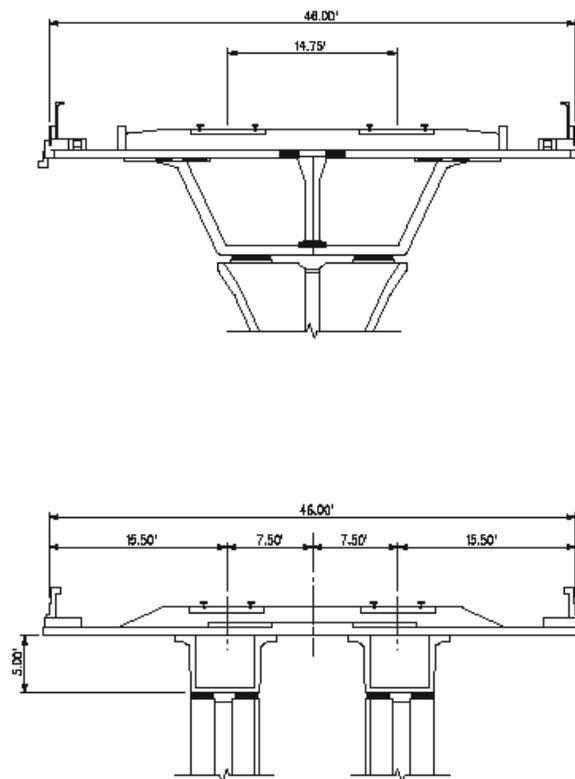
AVE Box Girder and Double Beam Cross Section
